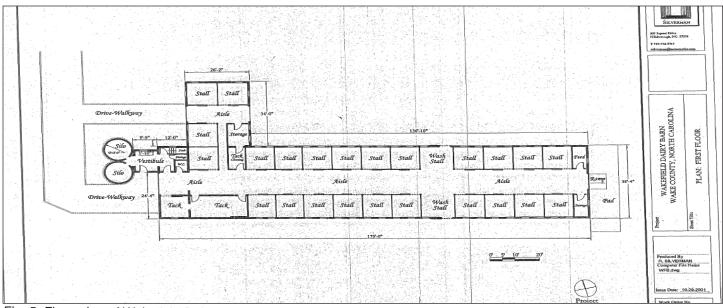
Floor plan of Wakefield Dairy Complex Dairy Barn prior to renovation
